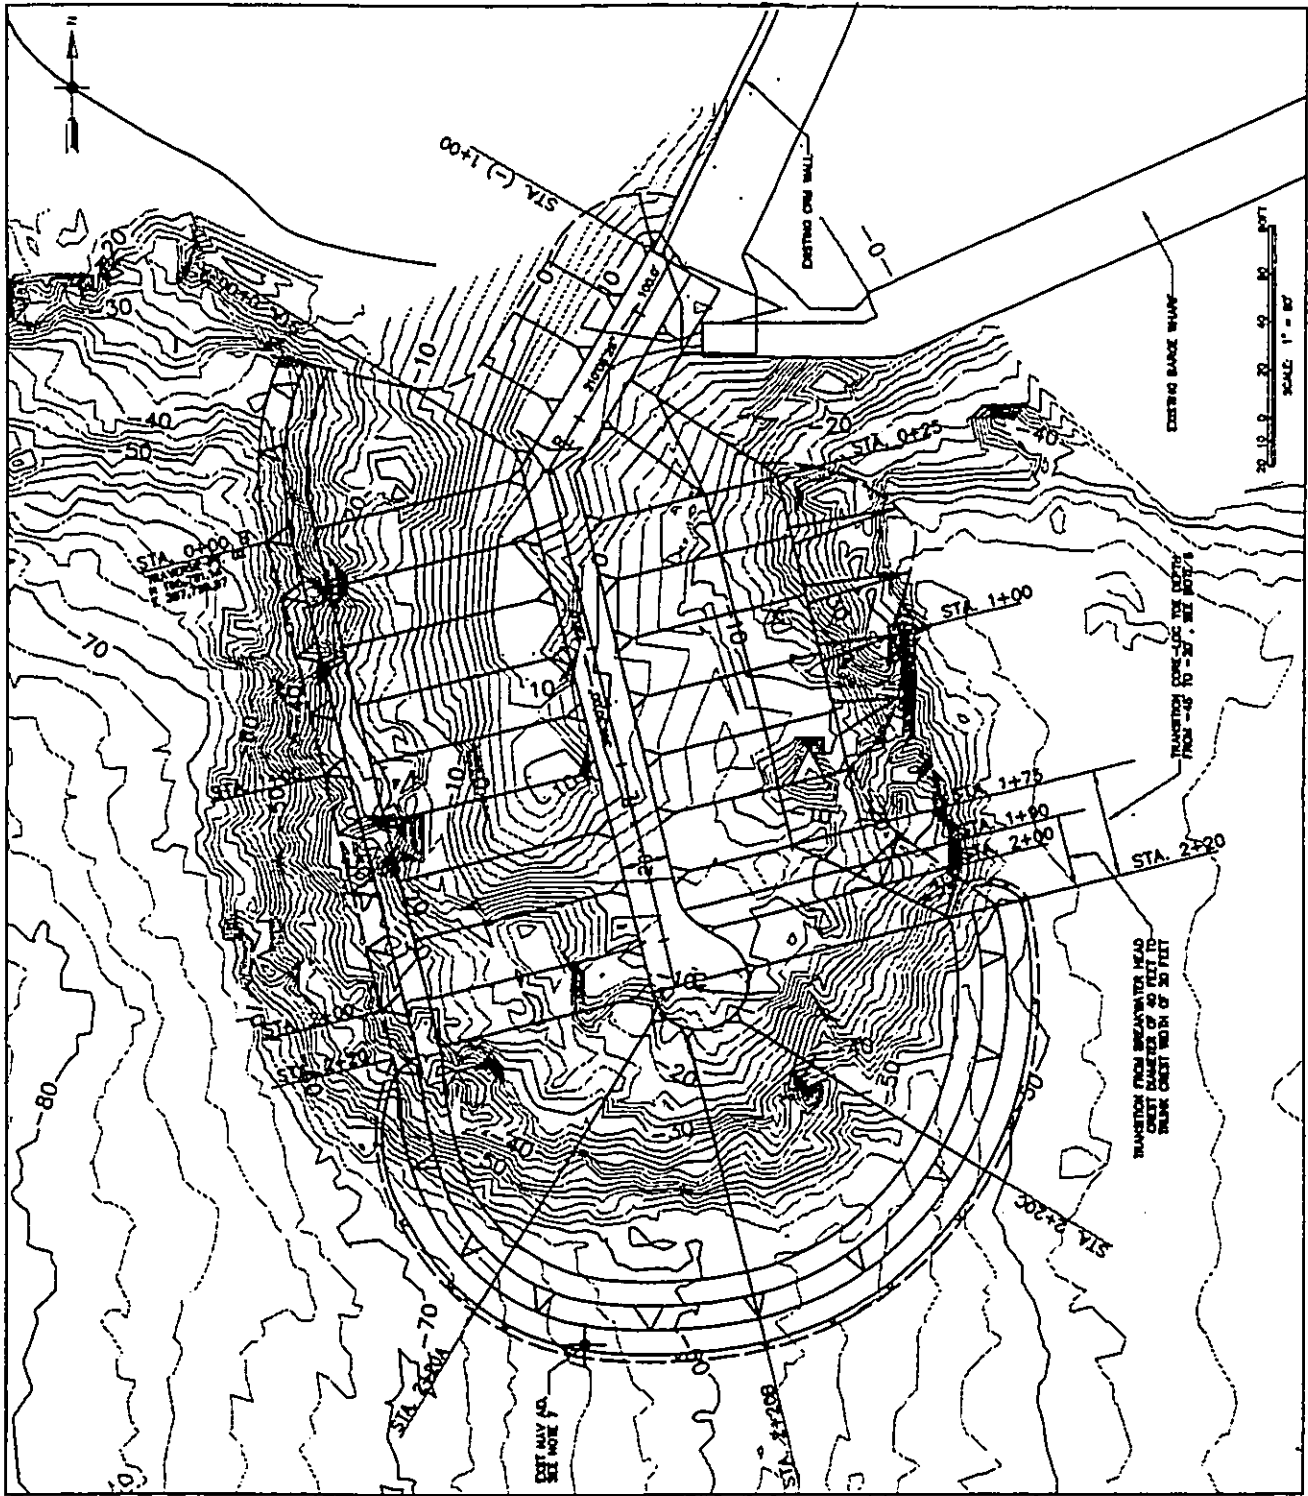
Recommended Plan of Improvement (final Alternative 5) for breakwater repair at Kaumalapau Harbor, Lanai, Hawaii (Source: Corps 2000)
